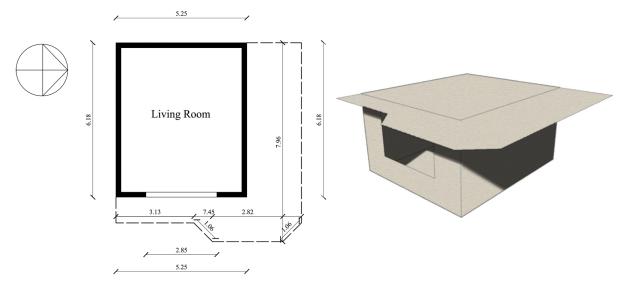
Living Room Plan and 3D Schematic without Rawshan on the left hand and Living Room Plan and 3D Schematic without Rawshan on the right hand.
